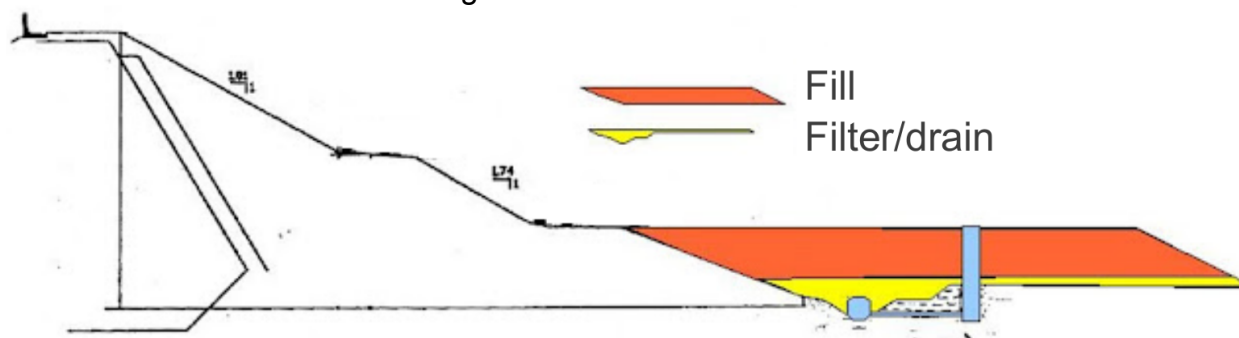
Proposed stabilizing bank with a inverted filter for the right bank dike of Massingir dam
